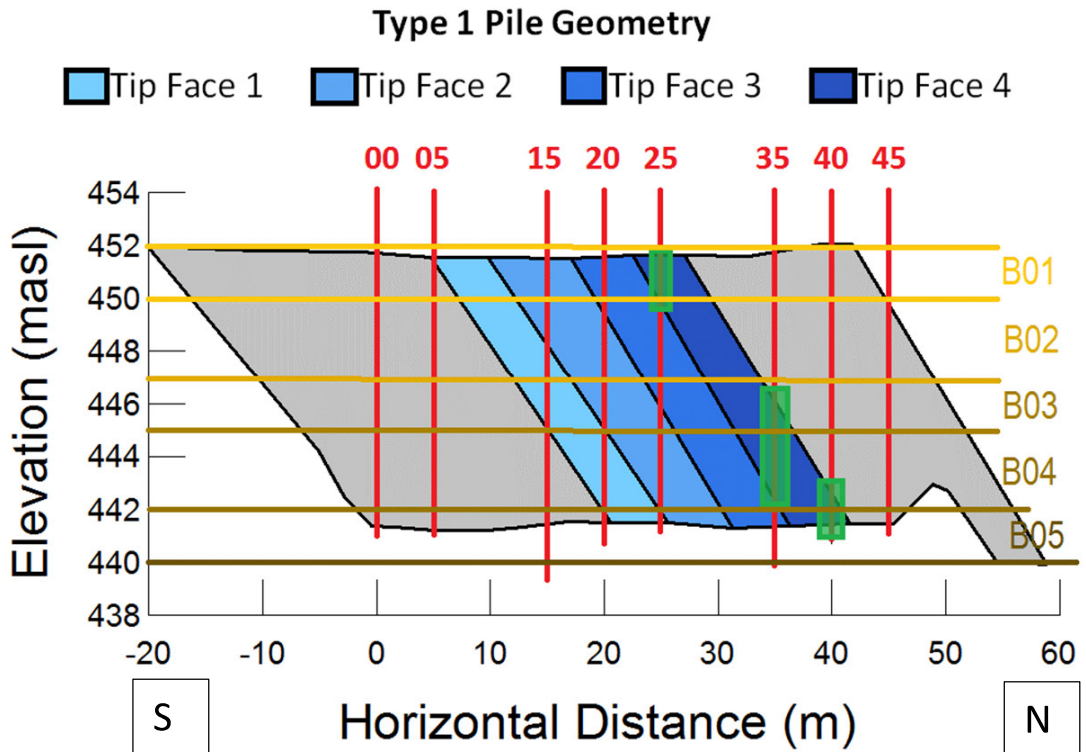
Type I Pile with Paired Construction and Deconstruction Data (Green zones)
